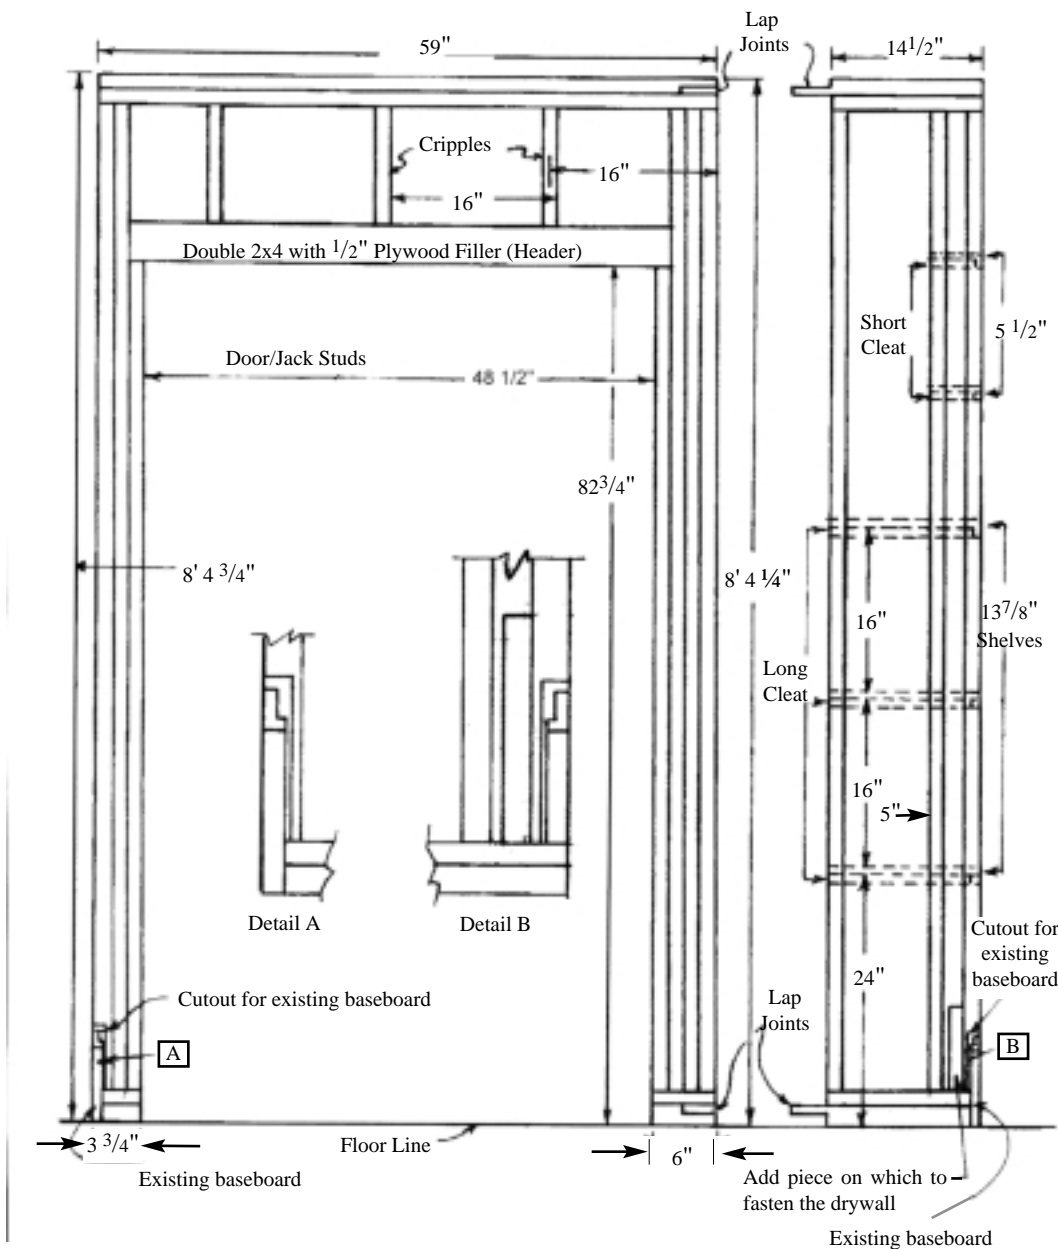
Stud layout for the two new walls which also notes the position of the shelves
